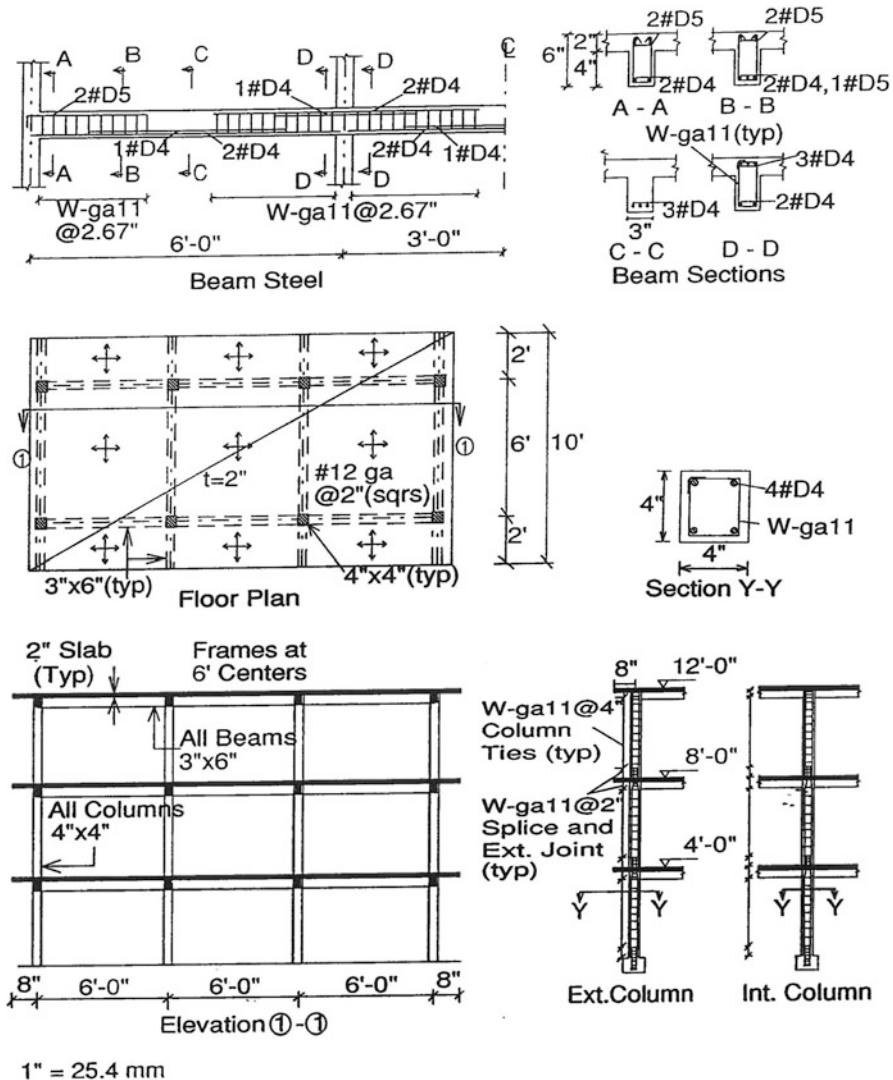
Plan, elevation and reinforcing details of original model (Bracci et al. 1995a)
